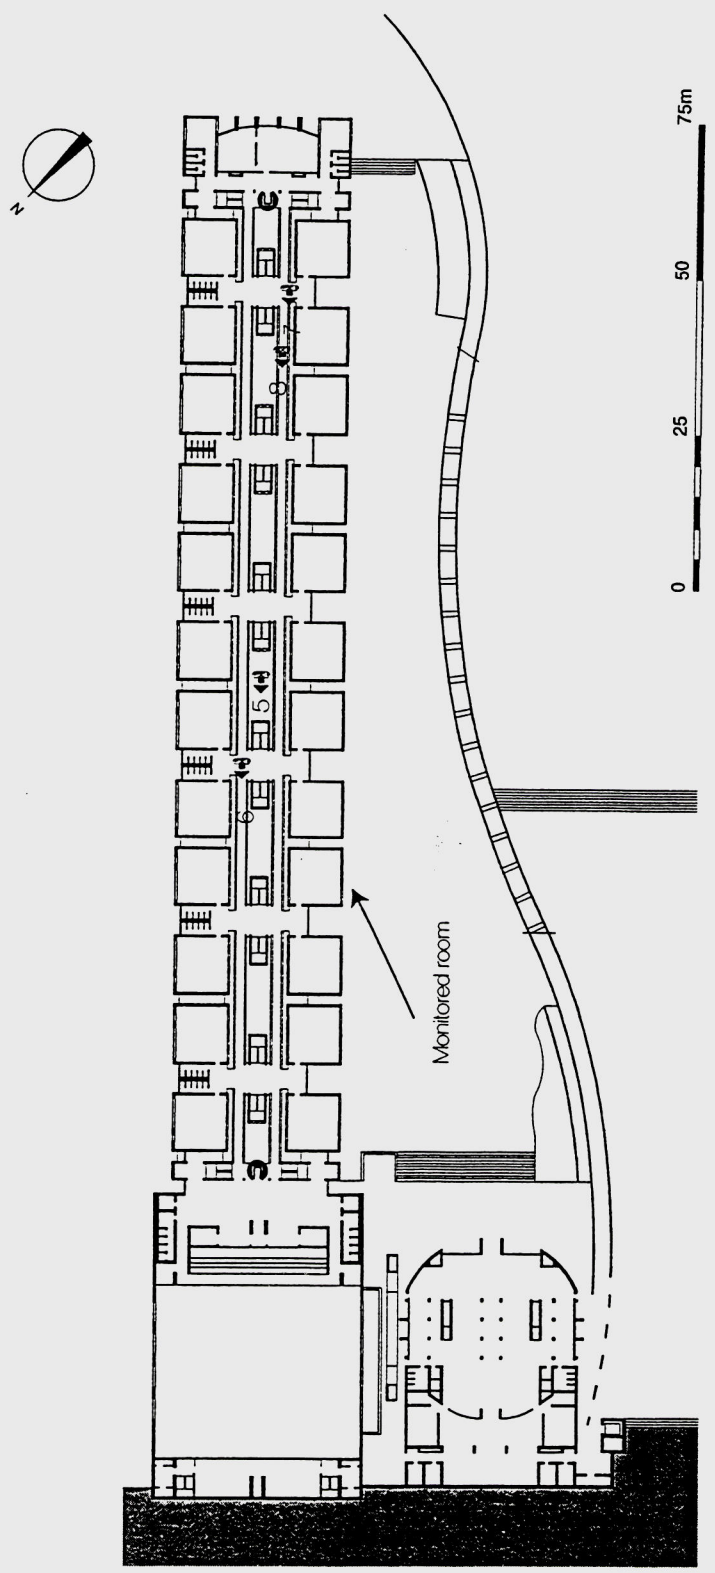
Plan of the Collège de la Terre Sainte (location of the monitored room is indicated)
